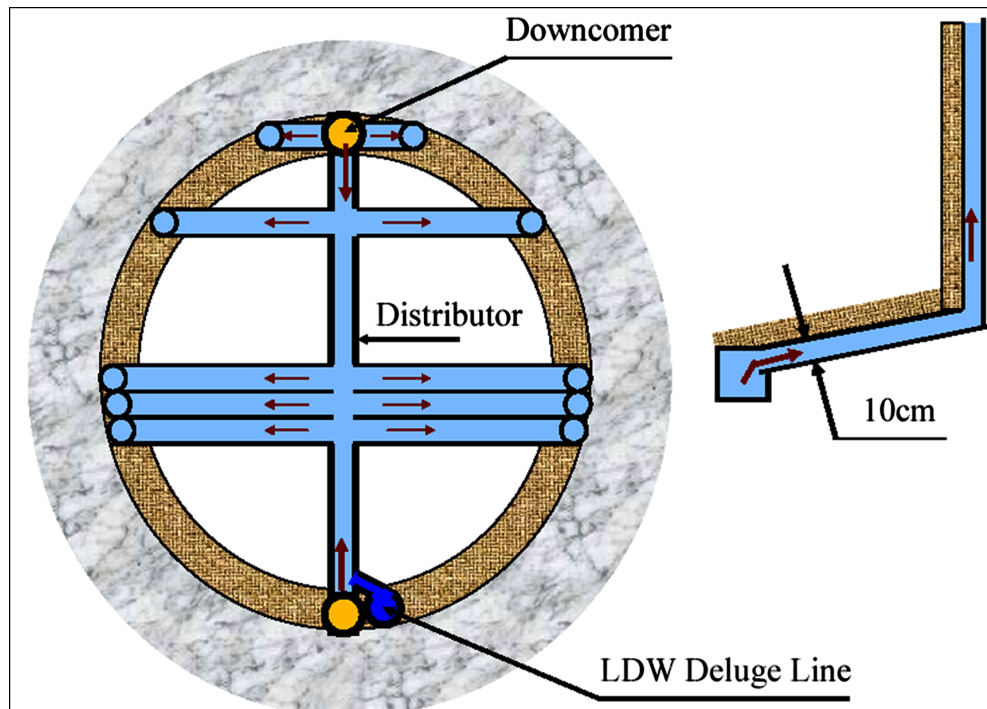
Schematic Arrangement of the BiMAC Pipes
